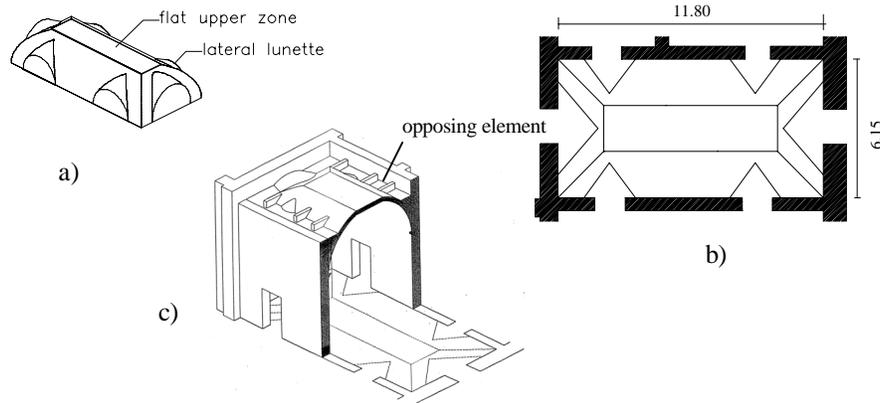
Geometric features of the vault: a) tridimensional extrados view; b) plane view; c) tridimensional sectional view
